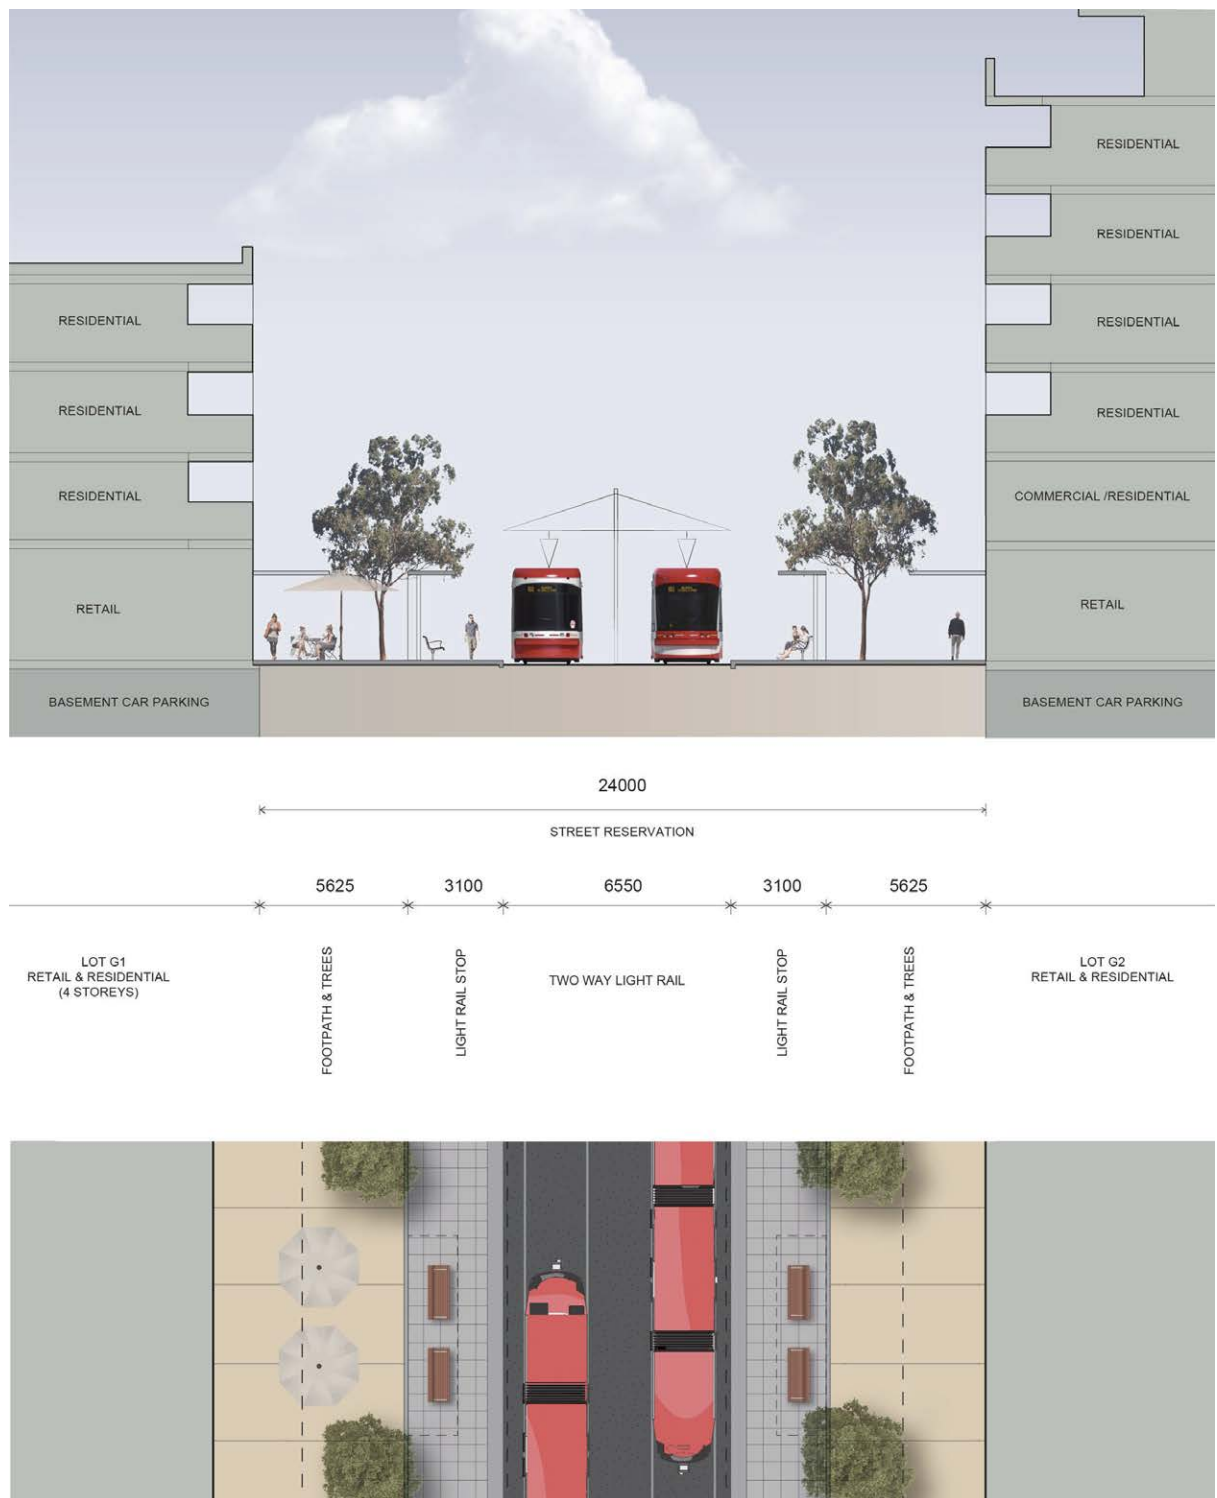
Typical street section 1 – Factory Street
